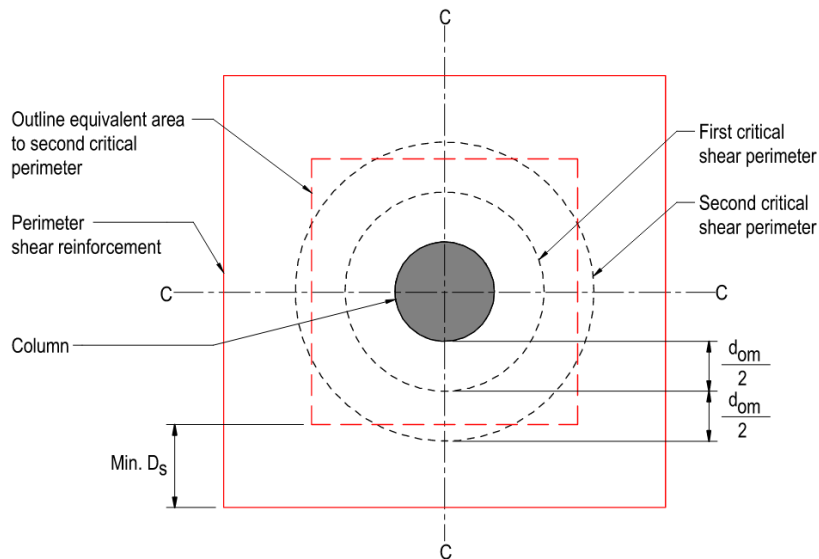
Flat Slab – Circular column: (Shear reinforcement required to 2nd critical perimeter)
